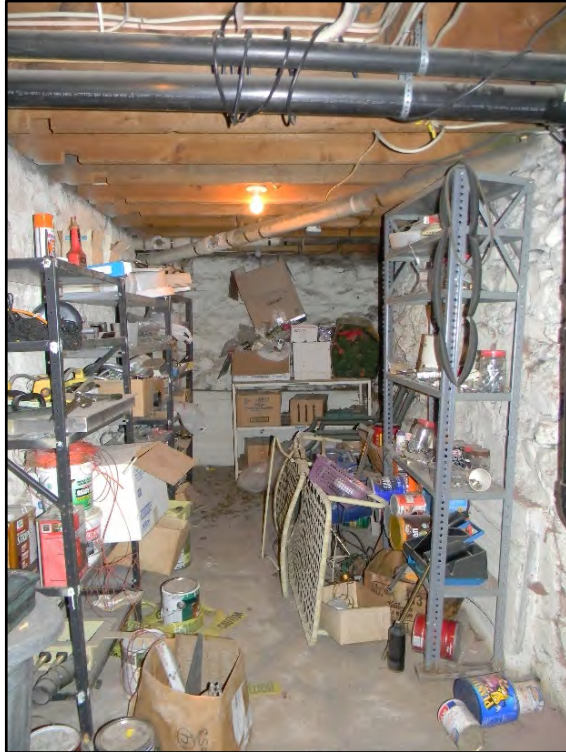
Additional view of the space below the dining room (the masonry walls are painted).
